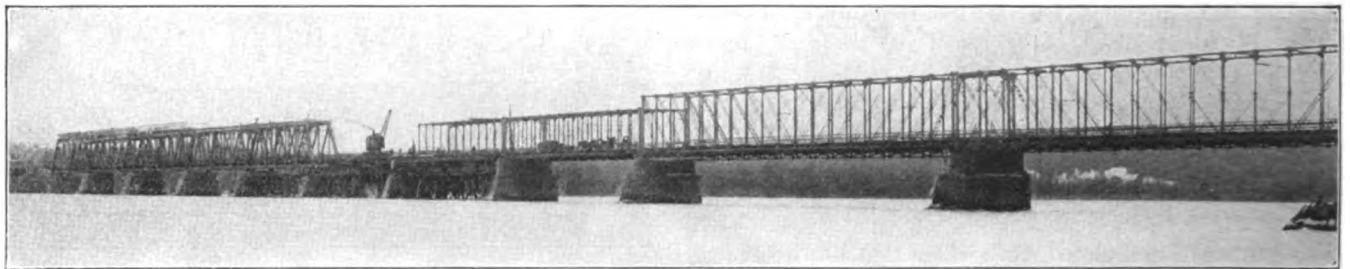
RECONSTRUCTION OF MISSISSIPPI RIVER BRIDGE AT KEOKUK, IOWA (DEC. 1, 1915)
